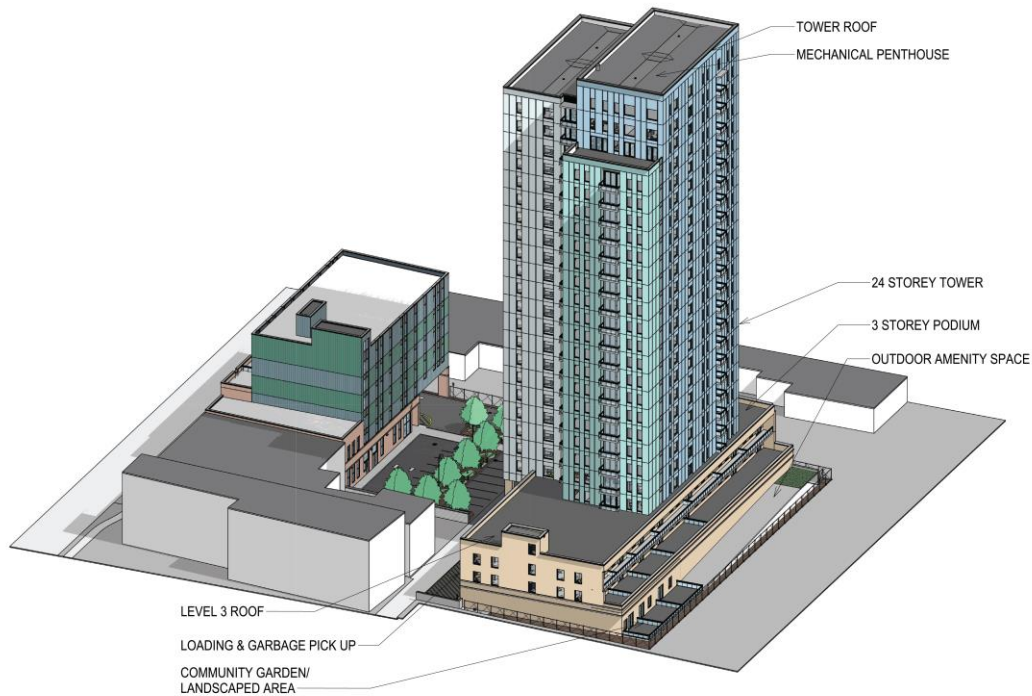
Axonometric view of proposed building massing and site layout, facing northeast
